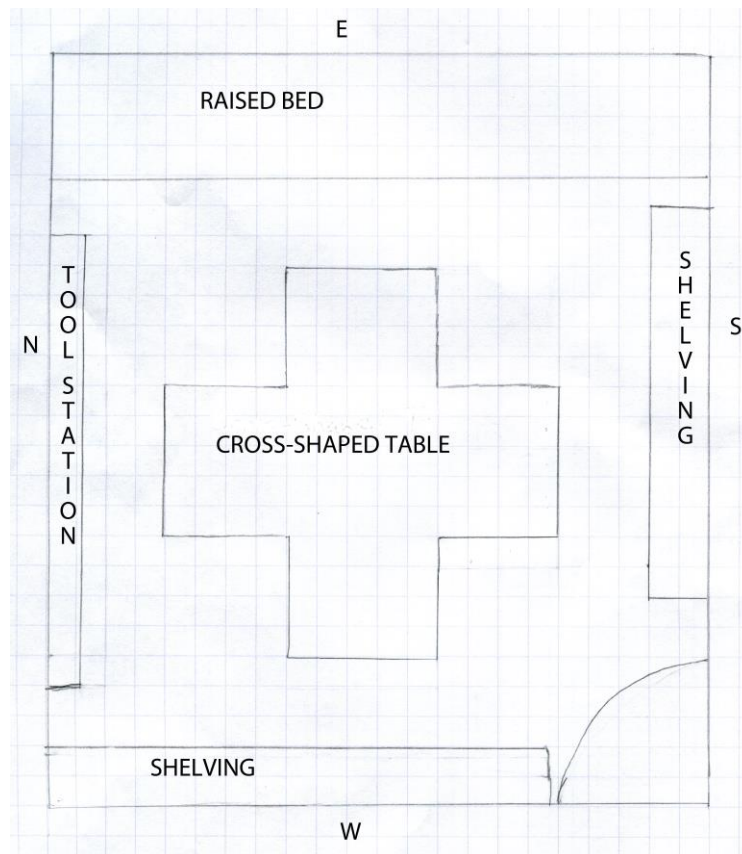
Interior floor plan of 50 Shades of Clear (Drawn by: Matthew Megill 10/10/2014)
